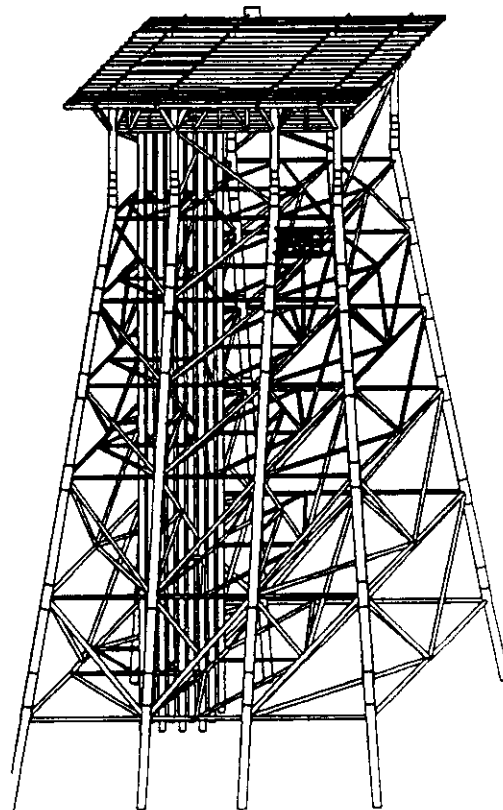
Typical pile-supported platforms in Bay of Campeche
